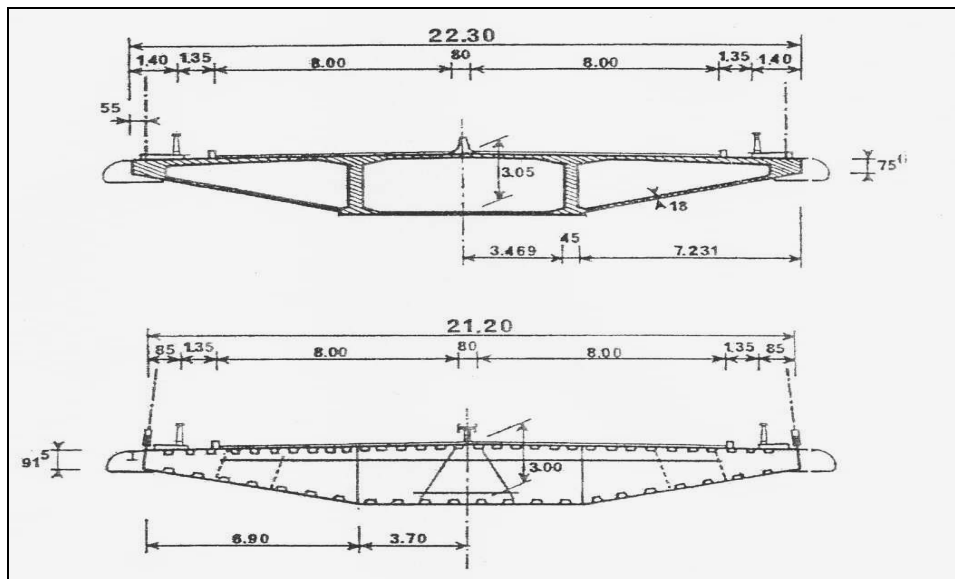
Transversal concrete sections (above) and steel sections (below) [8]
